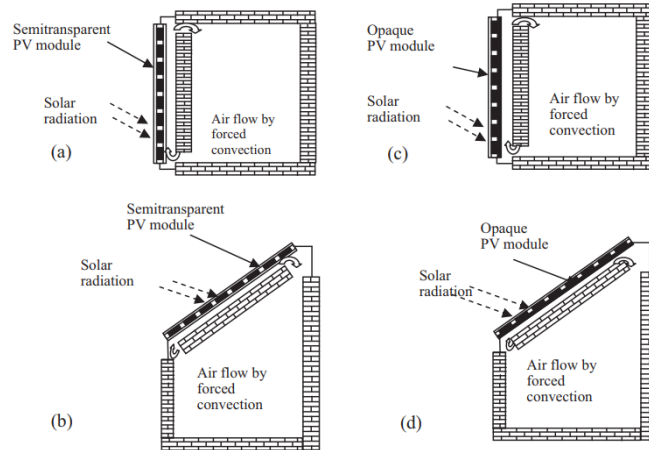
Cross-section view of BISPVT and BIOPVT collectors for roof and façade integration with air duct [54].
